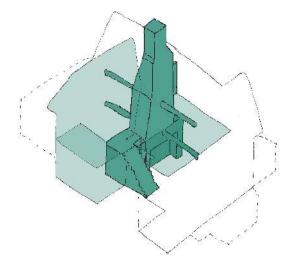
17th/18thC phase. Central brick chimney with integrated first floor within hall and staircase; west cross wing extension.
